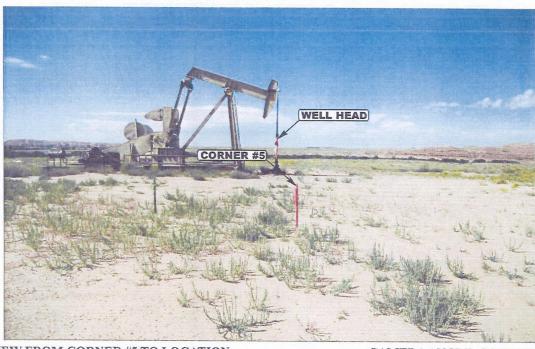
PHOTO: VIEW FROM CORNER #5 TO LOCATION
